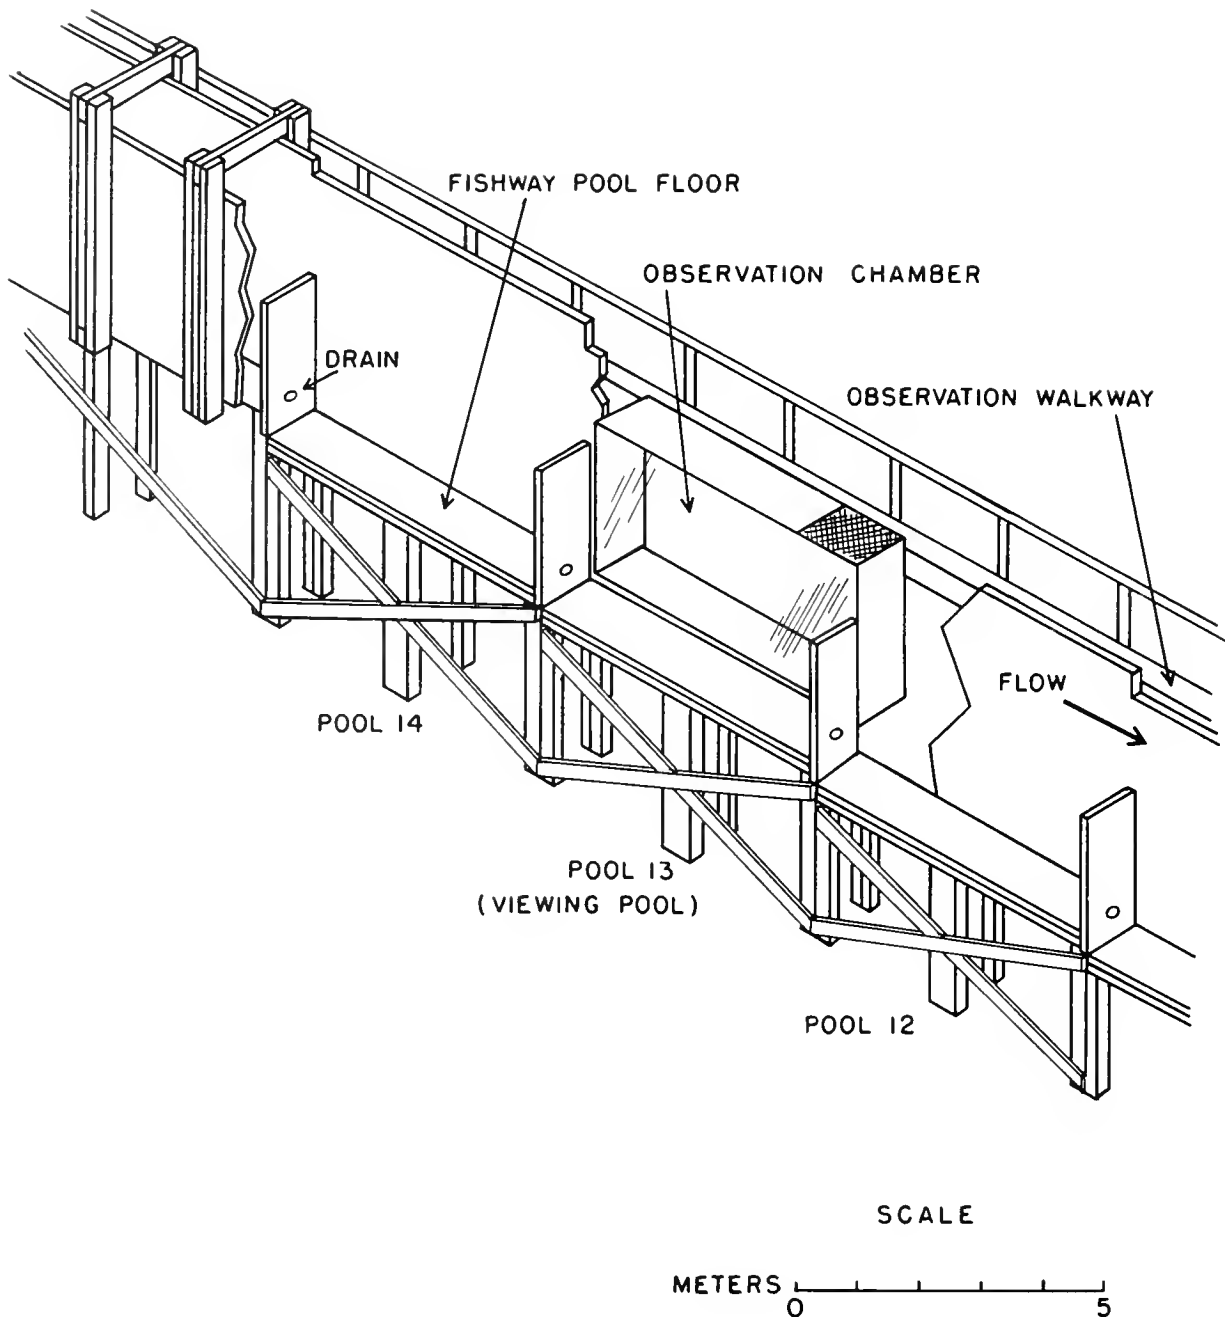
Section of the 1-on-16 slope endless fishway showing pool construction and location of observation chamber. Each pool was 4.9 m. long, 0.9 m. wide, and 1.8 m. deep. Note level floors in fishway pools.
